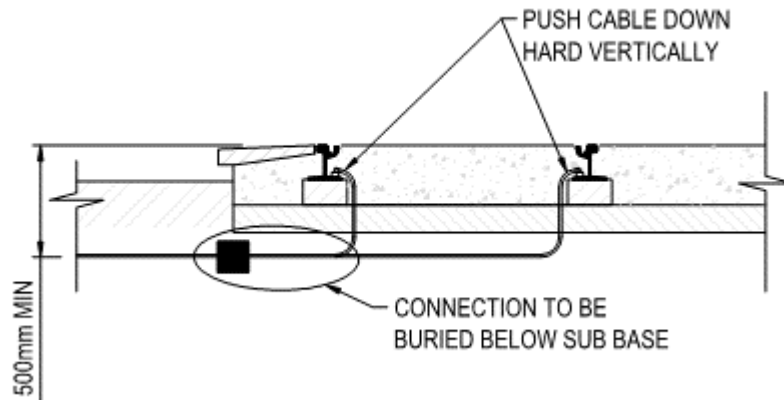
Typical Spider Connection Section in Paved Track
